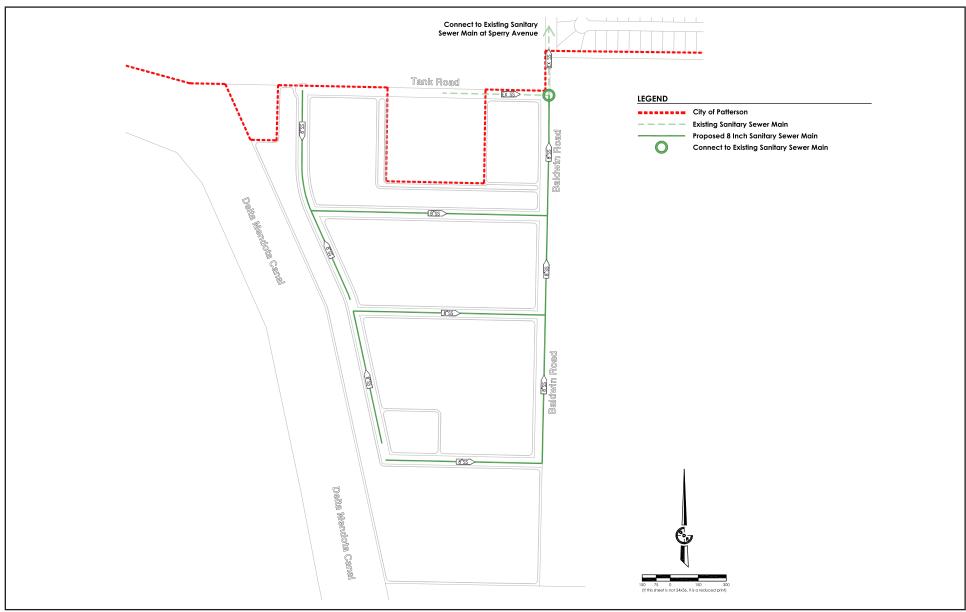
Zacharias Master Plan Sanitary Sewer Plan Temporary Vicki Lynn Lane Connection
